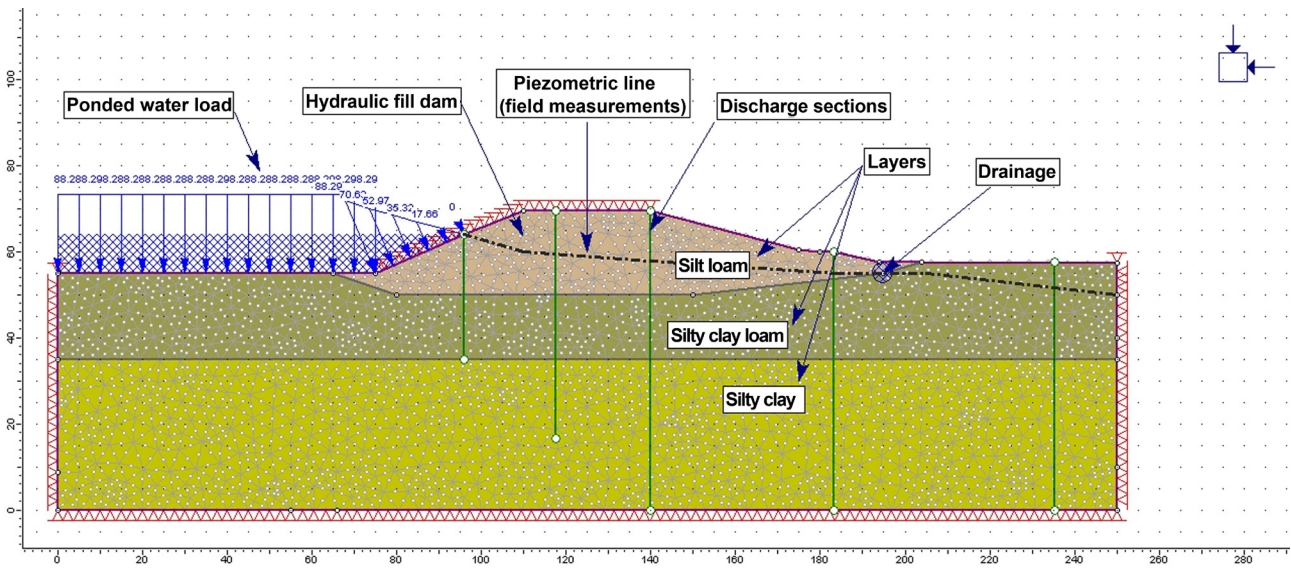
Geometric profile of the hydraulic-fill dam (m)
